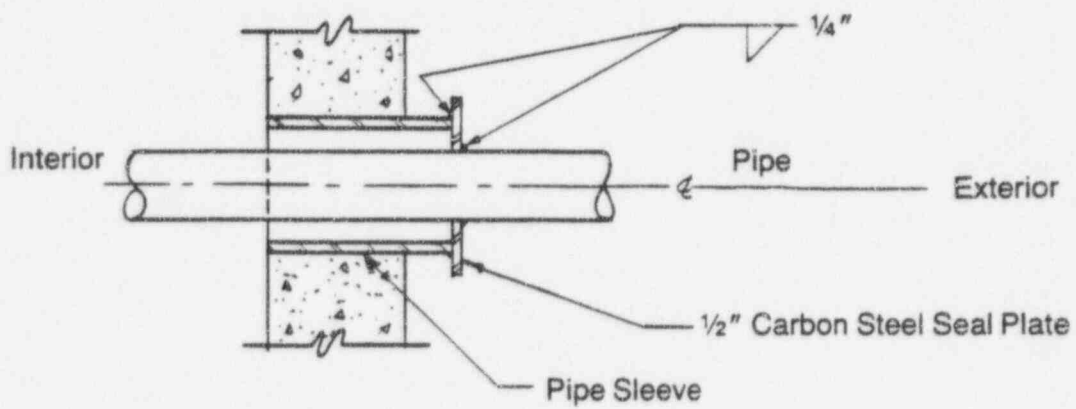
Typical Penetration Detail for Buried Pipe Entering Building at Exterior Wall
